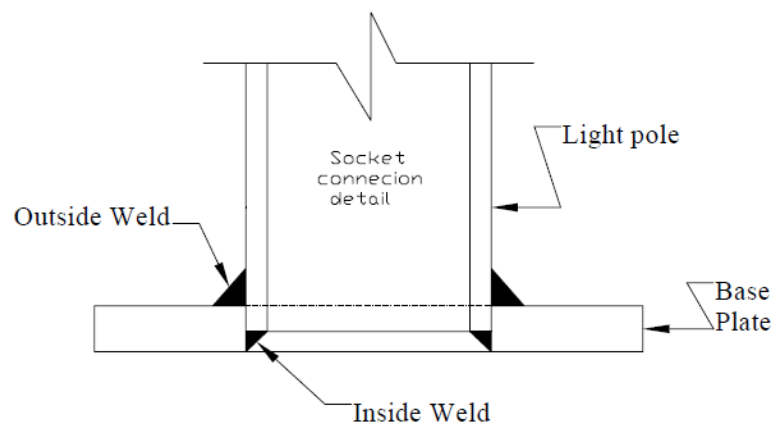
Fillet-welded through plate socket connection detail (Azzam, 2006)
